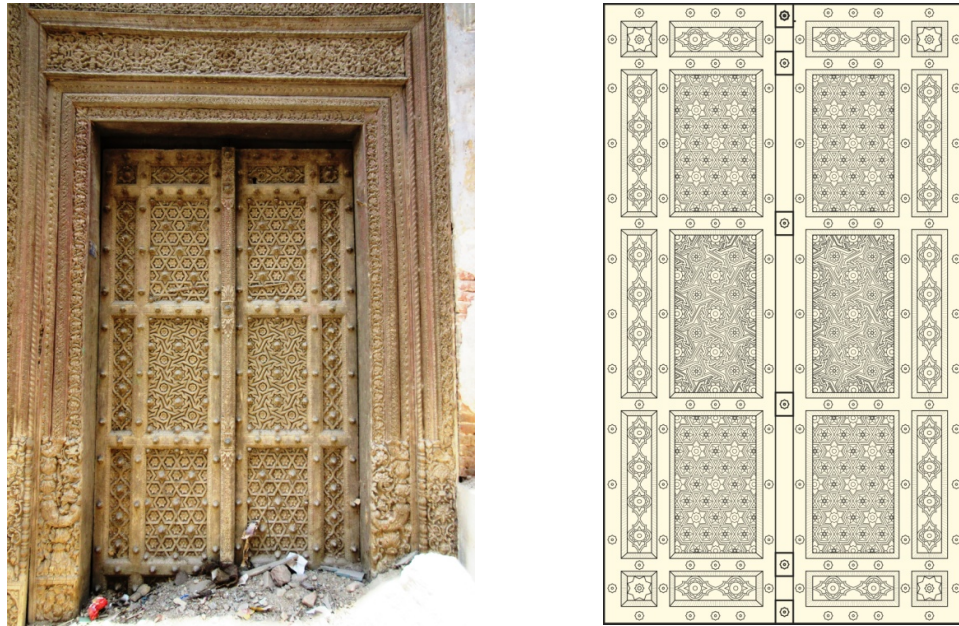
Wooden door of the old *haveli* in *Chhatta Jambudas* with layout and details
